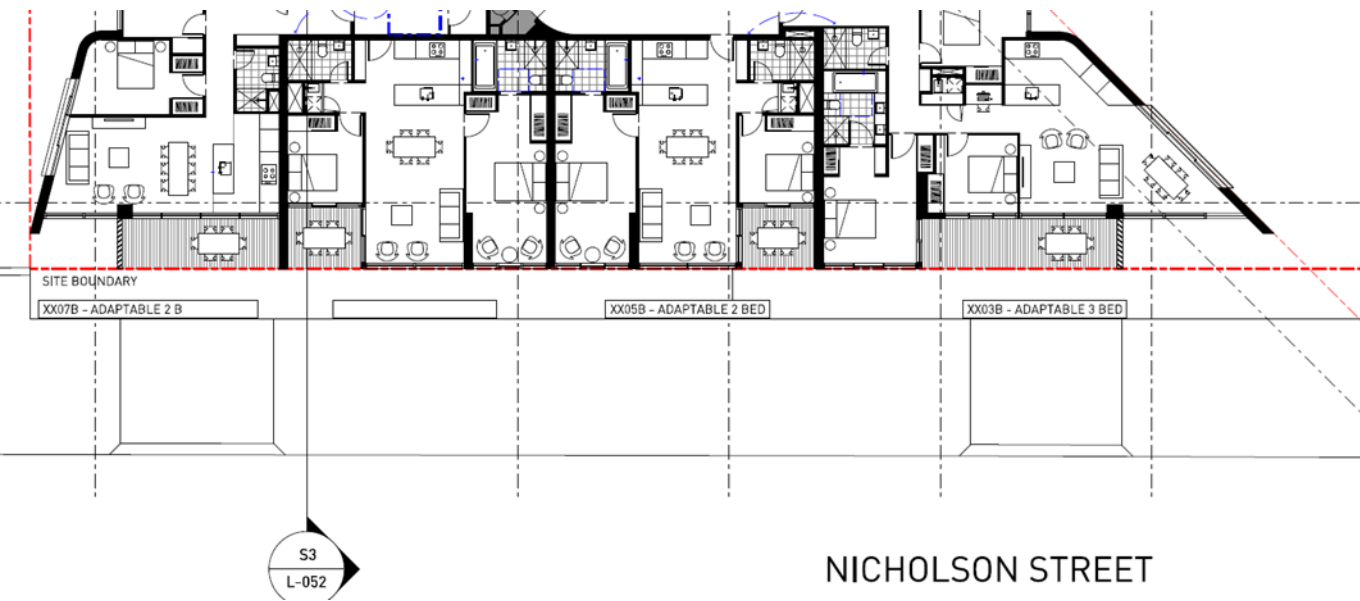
Typical floor plans of apartments along the western elevation of the Jackson, St Leonards Square
